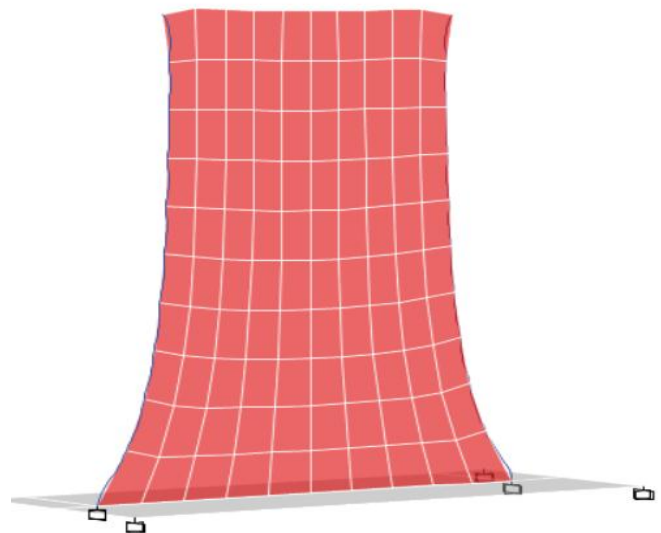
Deflection Diagram of CFRP two-way Hollow core shear wall with Channel shaped boundary elements.
